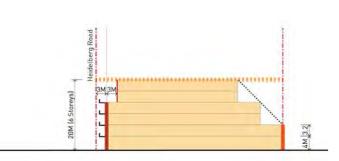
Testing of 8 storey developments with varied street wall heights and upper level street setbacks.
